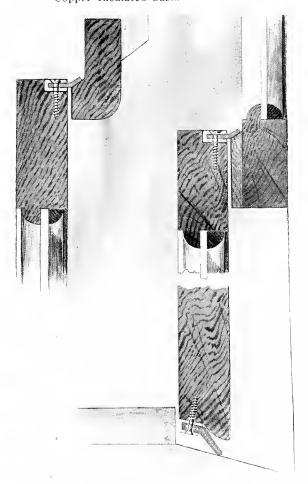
Universal Top and Bottom Channel-Holding Weather Strips.
